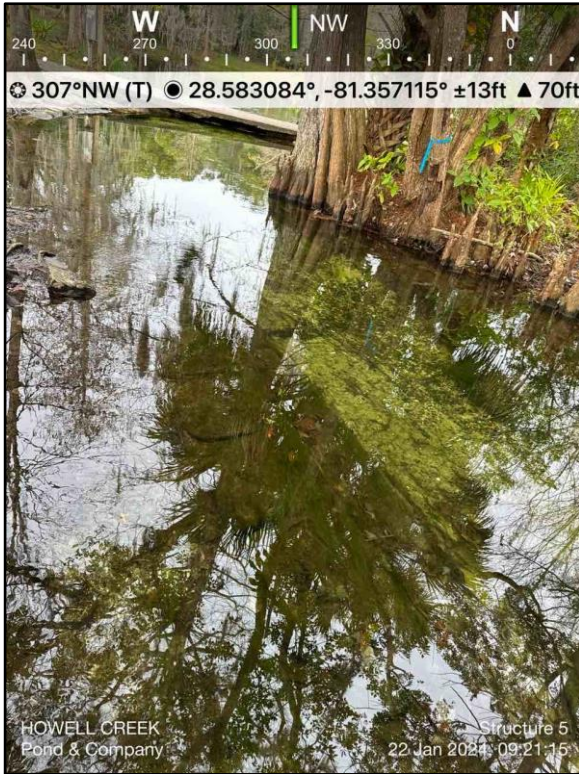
Pedestrian Bridge Crossing at Mead Botanical Garden Pond
